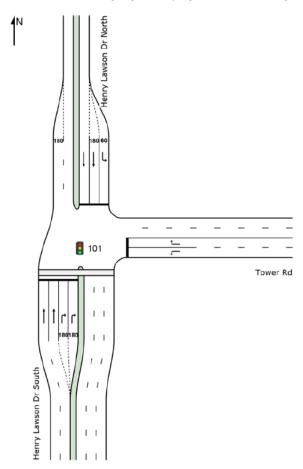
Henry Lawson Drive and Tower Road intersection Option 1
